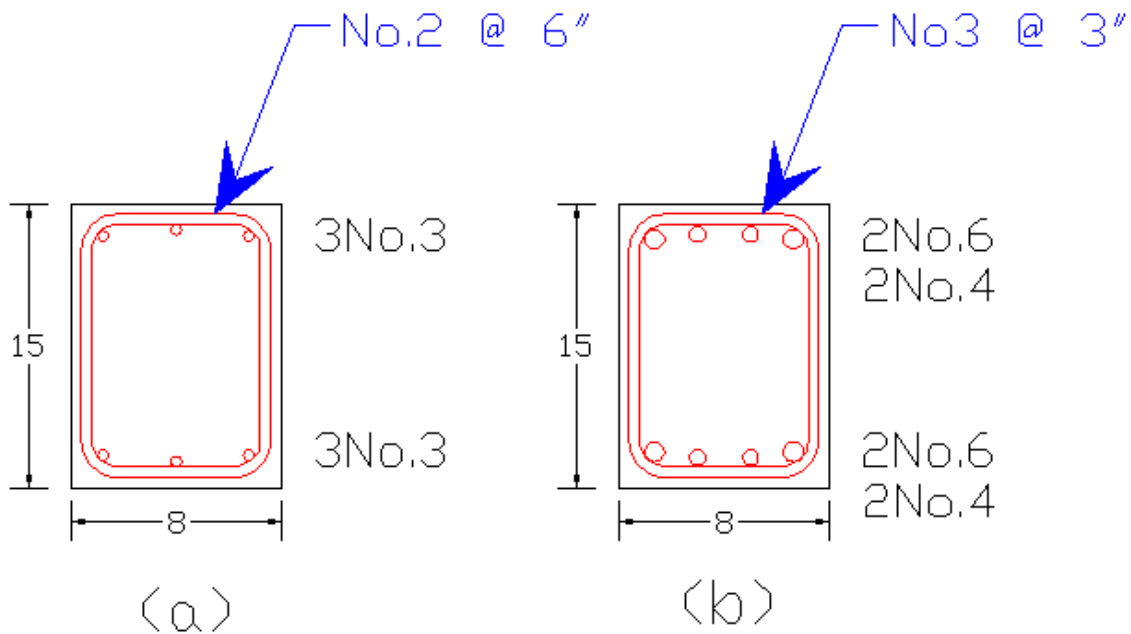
Beam cross sections: (a) Specimen F-RC. (b) FRP specimens
